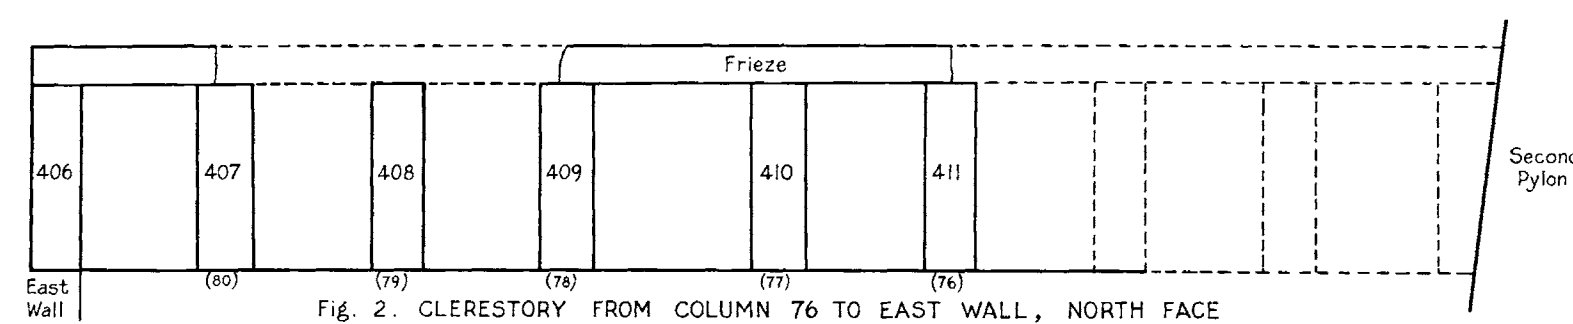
CLERESTORY FROM COLUMN 76 TO EAST WALL, NORTH FACE
